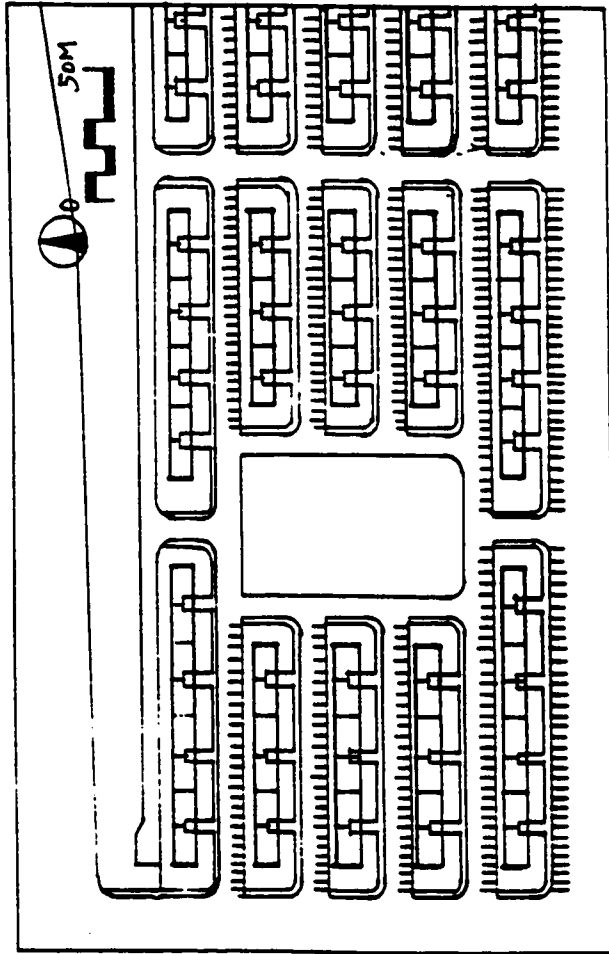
Site layout plan of Banpo Jukong-1 apartment complex
